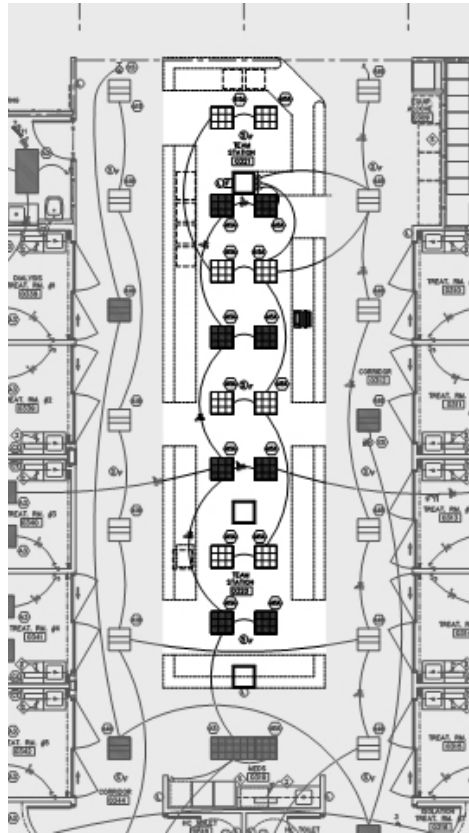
Team station floor plan, not to scale (dwg. E04.0H)
